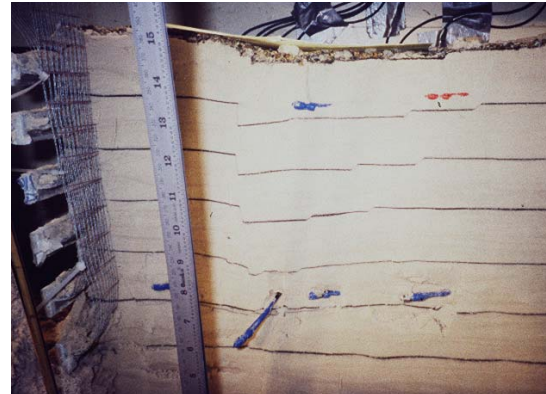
Excavation of a model reinforced soil retaining wall showing failure wedges in backfill (note the offsets in the horizontal black sand marker layers). This model that suffered significant deformations during very intense shaking on the centrifuge.
